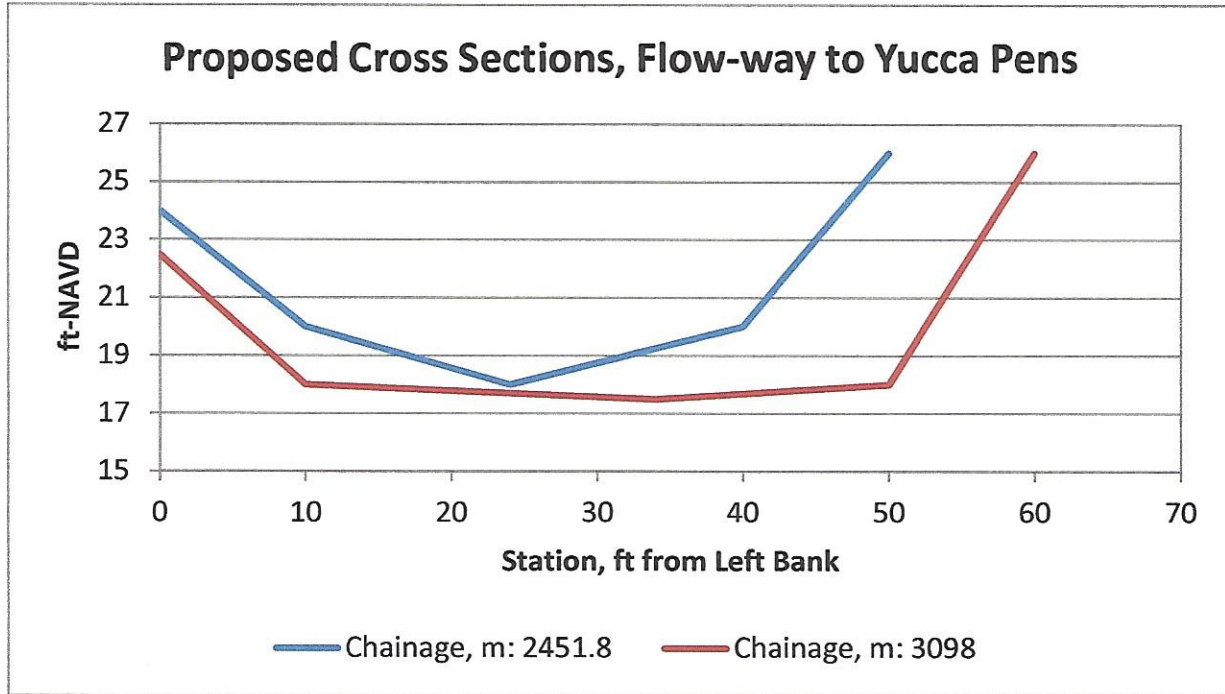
Yucca Pens Flow-way Proposed Cross Sections
